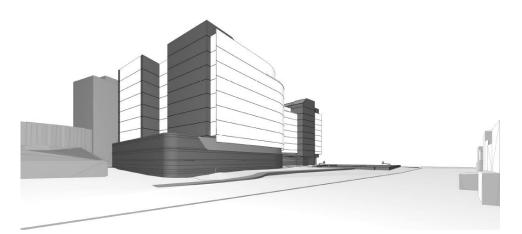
Outline of Building 1 when viewed from Henderson Road Source: Nearmap
